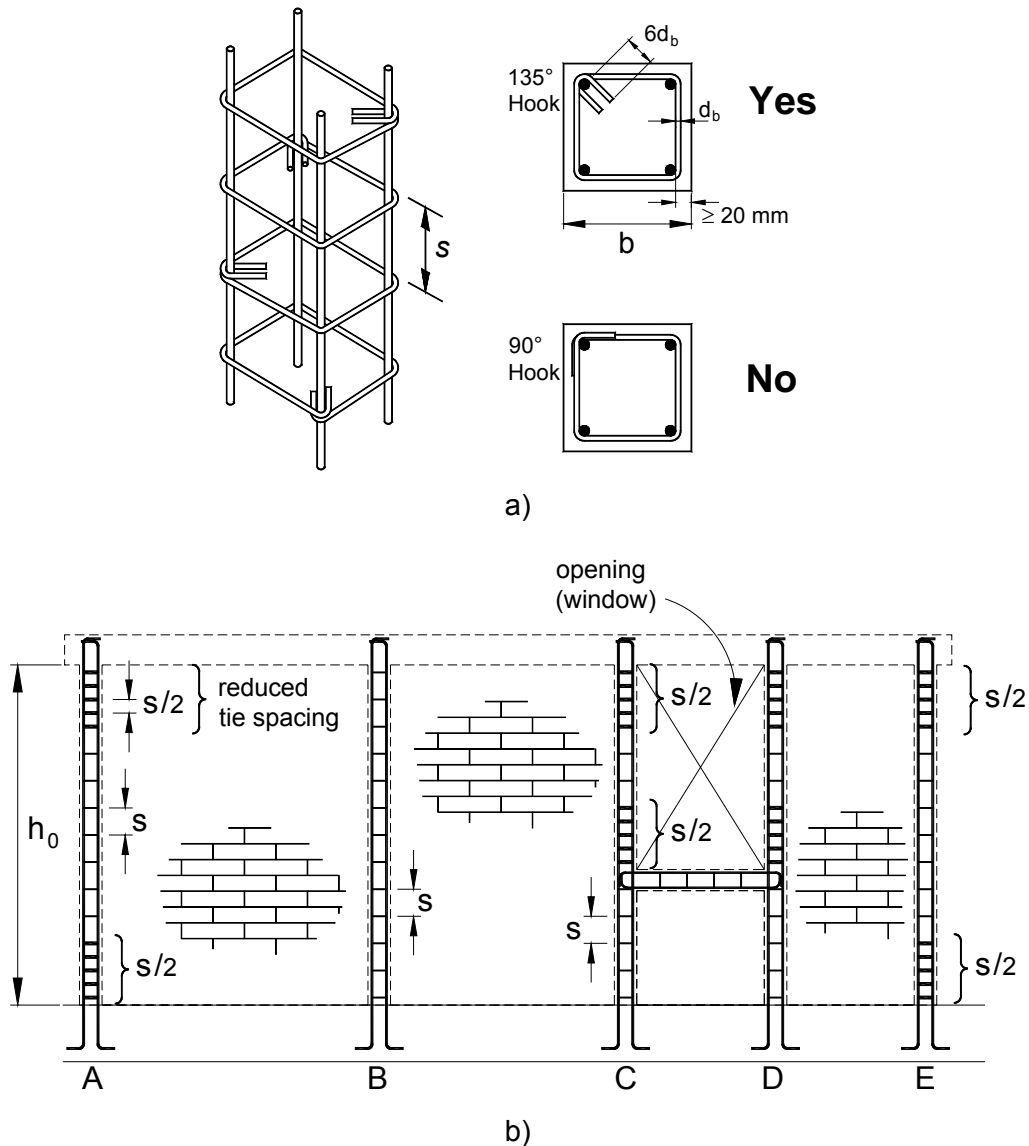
Tie-column reinforcement details: a) tie layout and detailing, and b) reduced tie spacing requirements at the ends of RC tie-columns.
